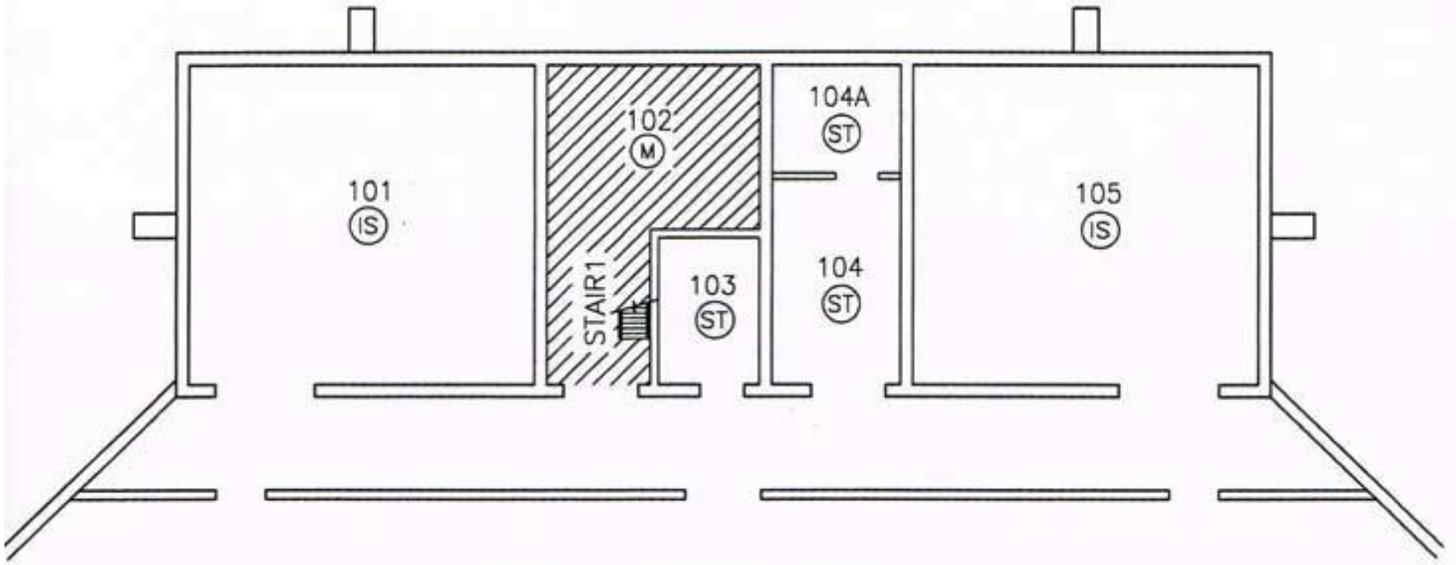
Building 827C - First Floor, Facility Keyplan, 1996. LLNL Archives, (PKS96-827C-001BB)
